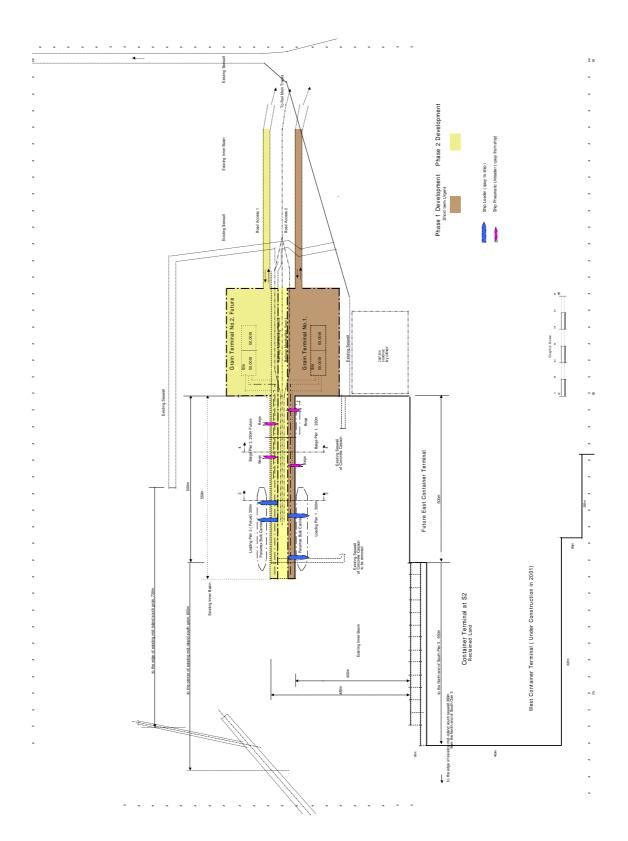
General Layout Grain Terminal, Alternative A2: South Pier 3
